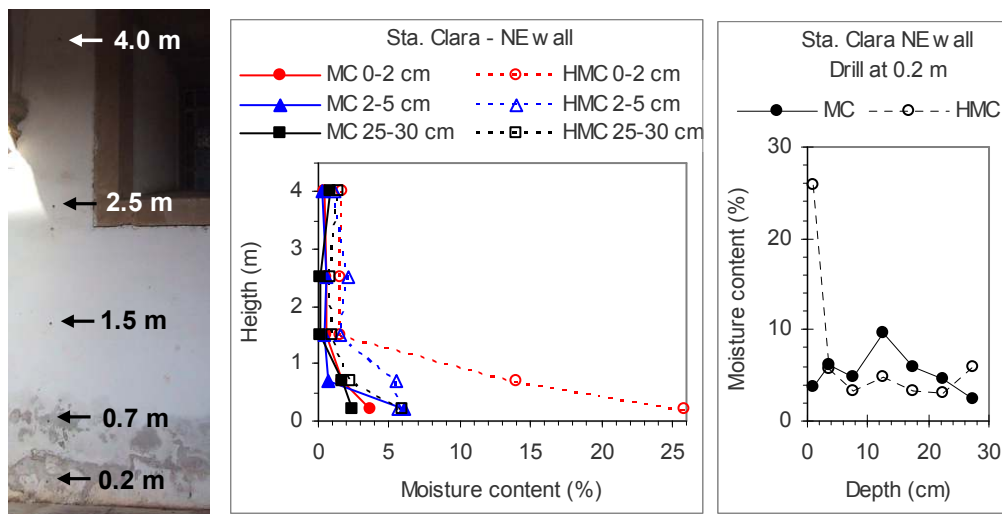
Sta Clara NE wall: drilling location (left) and MC/HMC profiles (centre and right)
